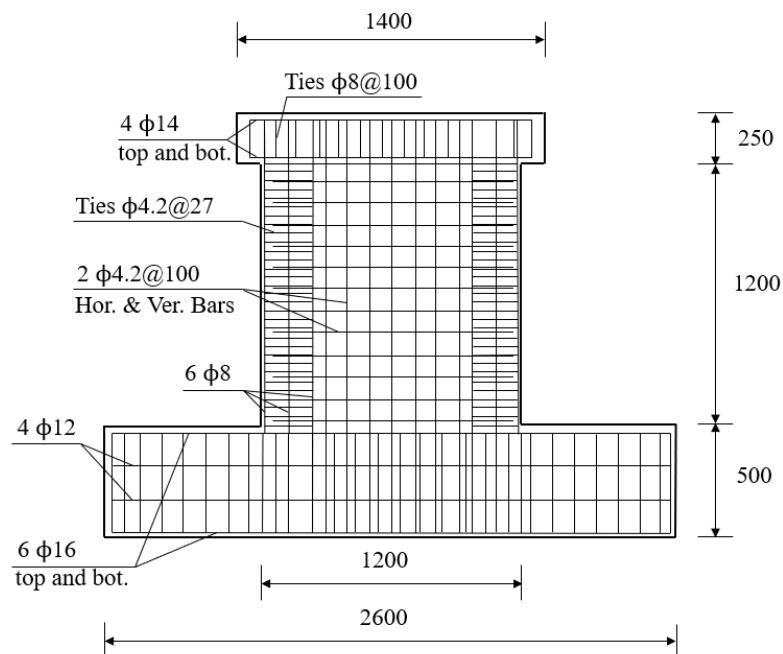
Reinforcement details of the short wall specimen LSW3 (Salonikios *et al.*, 1999)
